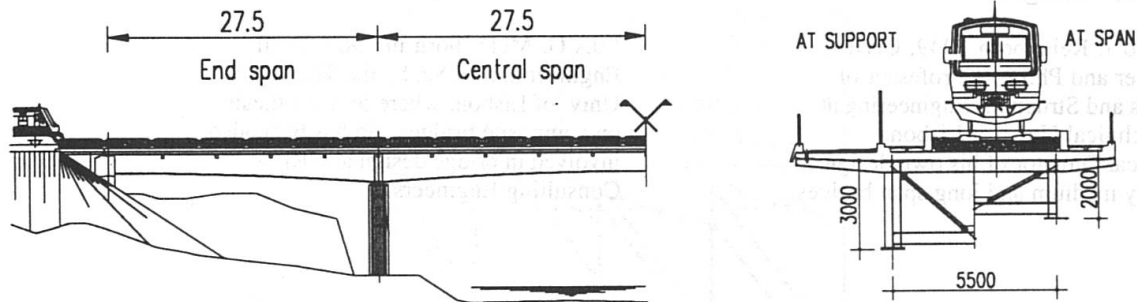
Longitudinal and cross section of a composite railway bridge over river Ave, Portugal
